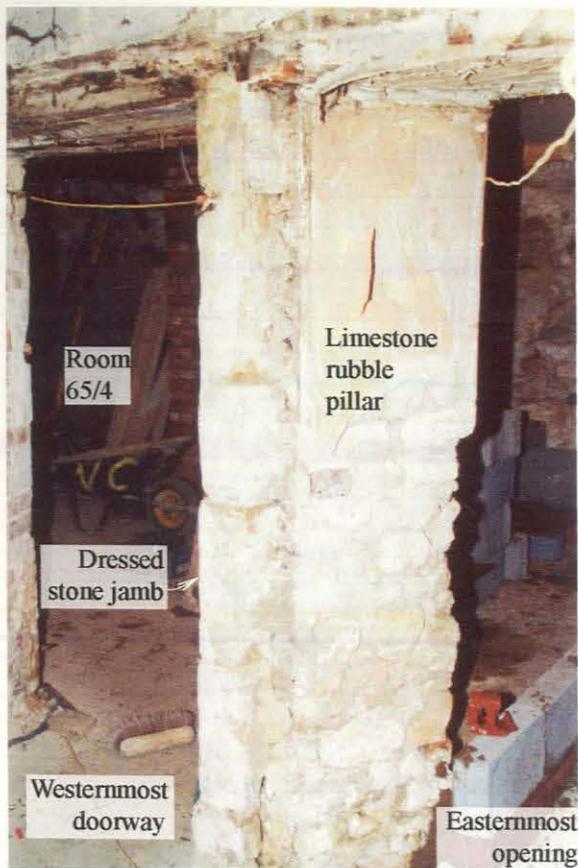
Kitchen 65/3, no.65, looking north; featuring the rubble pillar which divides the two adjacent openings in the north wall. Note the dressed stone jambs of the western doorway.
